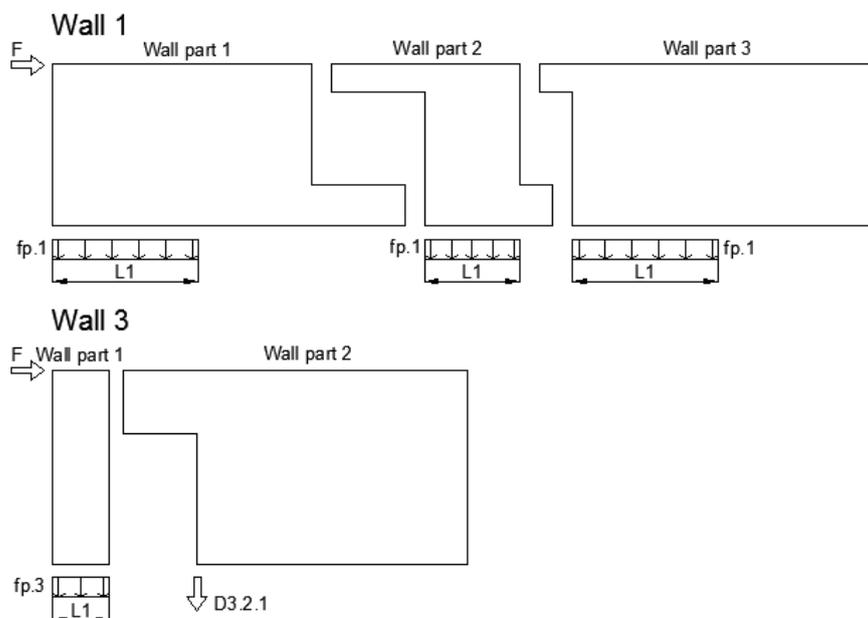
The locations and appearance of the anchoring forces in wall 1 and wall 3
